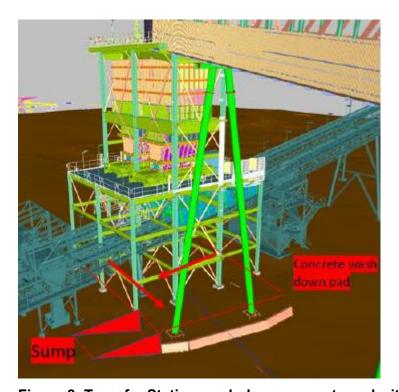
Transfer Station wash down concrete pad with drive in sump arrangement.
